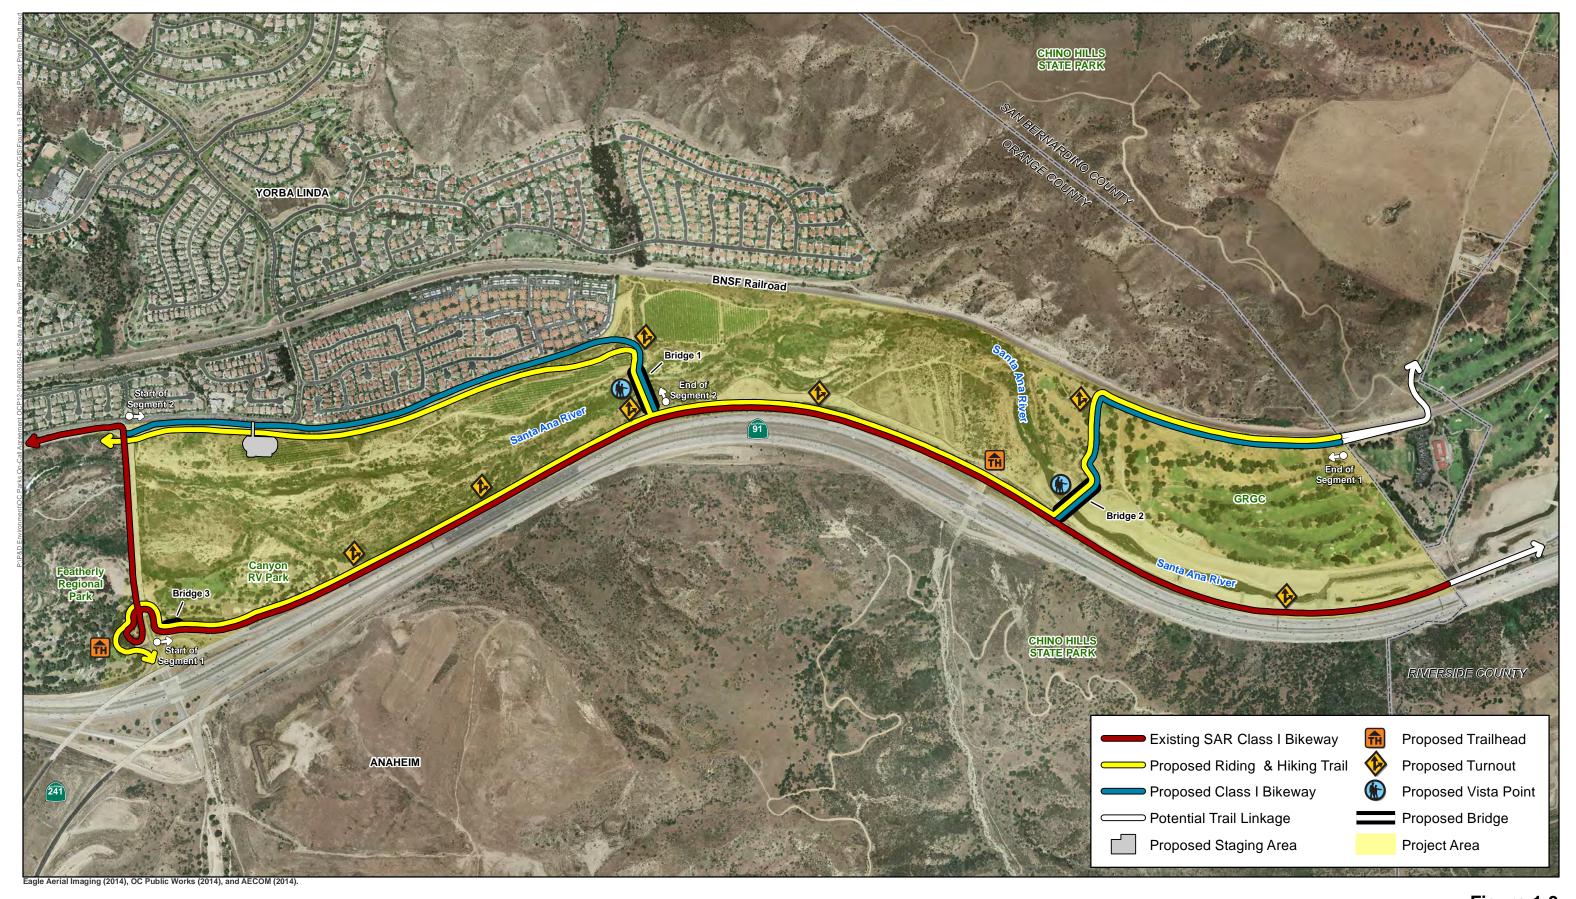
Proposed Project would consist of three spans, 115 feet each, for a total length of 345 feet. A turnout would be provided at the north end of Bridge #1 and a vista point would be provided at the midpoint of Bridge #1. A Staging Area is proposed adjacent to Segment #2, east of the La Palma Avenue and Gypsum Canyon Road intersection. It would be accessed by vehicles from La Palma Avenue. The Staging Area would be located at a lower elevation than La Palma Avenue.
